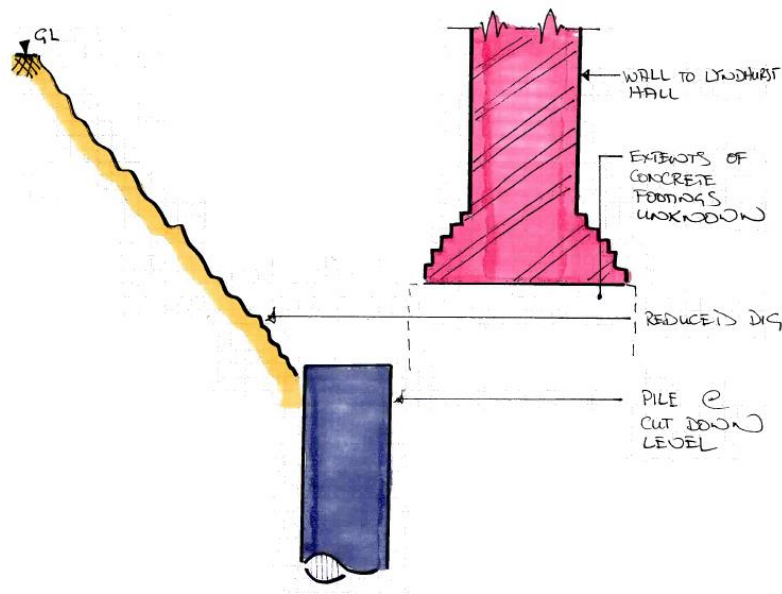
Potential undermining of foundations to Lyndhurst Hall during construction of adjacent basements (depending upon extents of existing concrete footings)
